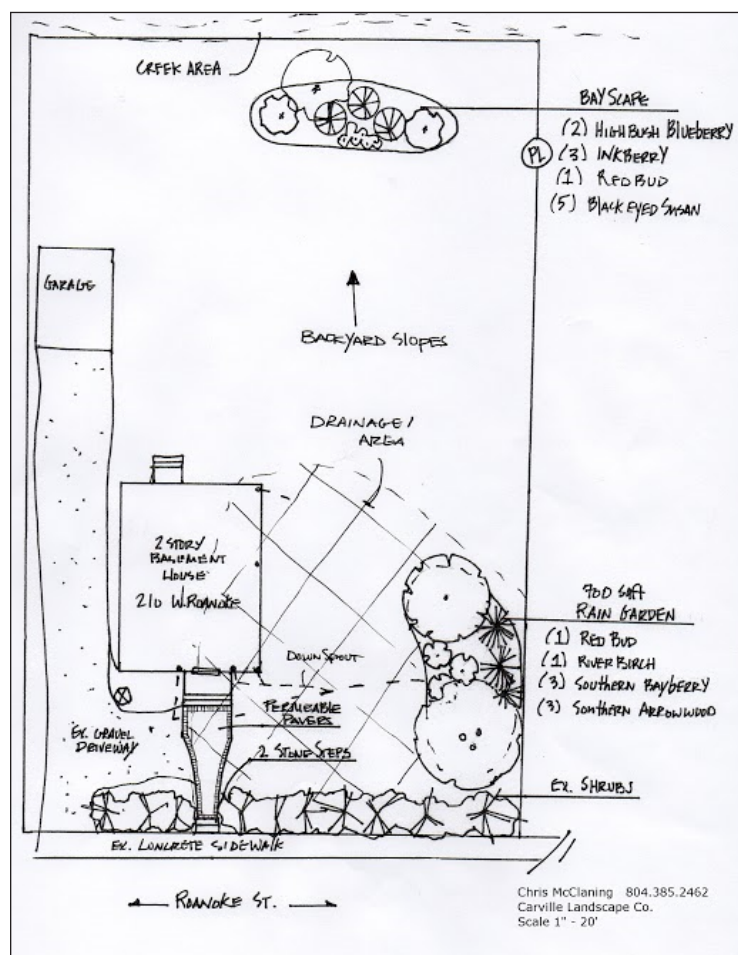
An example of a planting plan, included in the site plan, showing the BMP location and plant options.
